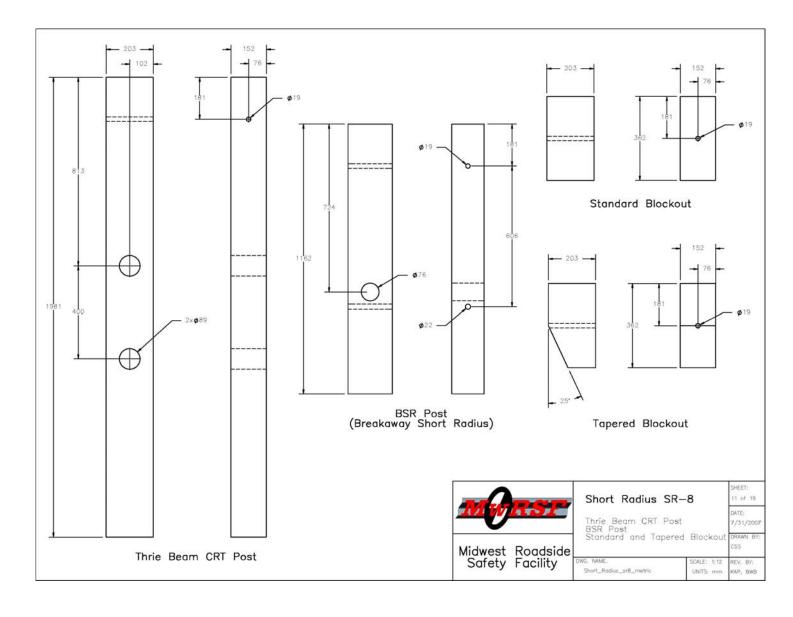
Thrie Beam CRT Post and BSR Post Details
